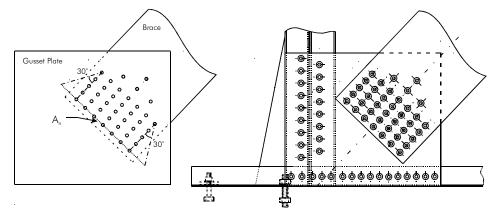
Whitmore section and a corner detail of a heavy wall
